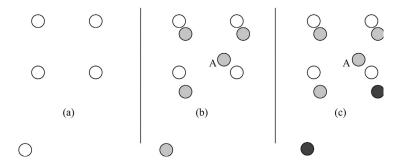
As-built and design locations. (a) Design pile location; (b) as-built location; and (c) additional pile.
